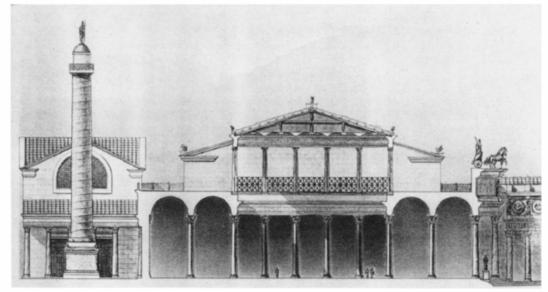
Trajan's Forum, restored north-south section facing east, showing facade of east colonnade and hemicycle, section through Basilica Ulpia, Trajan's Column, and the east facade of the east library. (Courtesy J.E. Packer)
